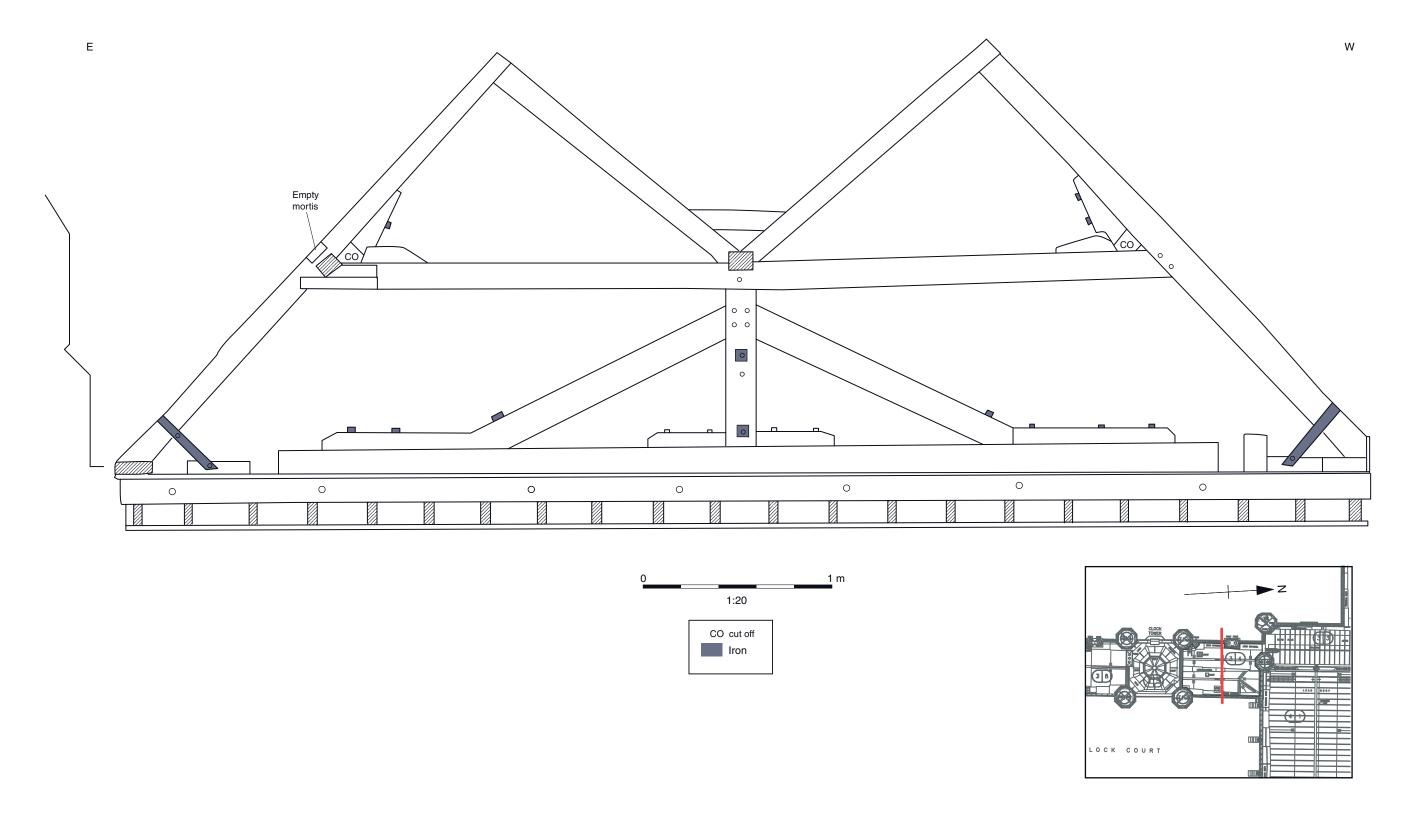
Hampton Court Palace, Base Court V, Section through the Main Roof showing north face of Truss 2
